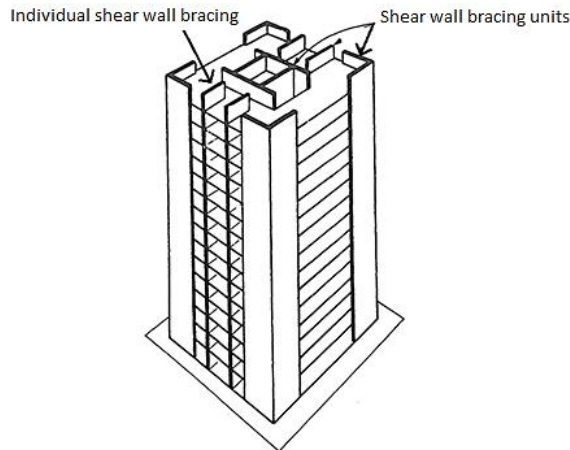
A tall building braced by individual shear walls and combined shear wall units. [Smith and Coull (1991)]
